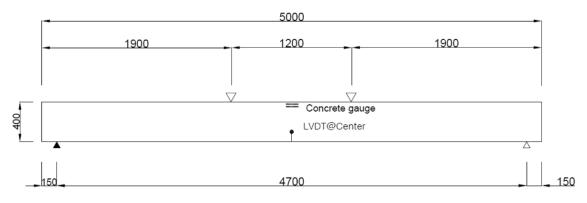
Set-up and detail of gauges and LVDT (unit: mm)
